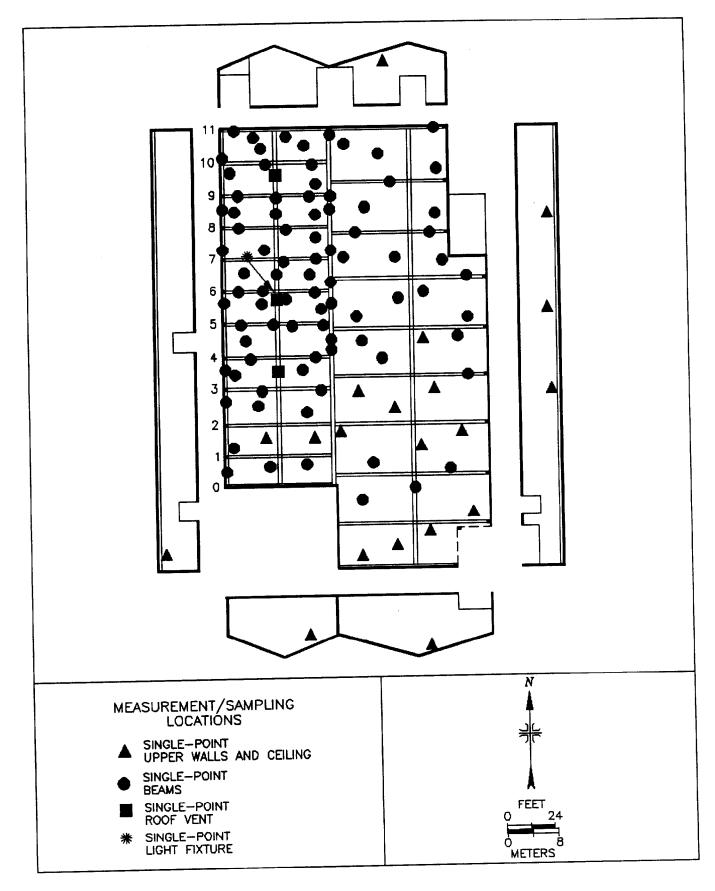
Building 3, Upper Surfaces — Measurement and Sampling Locations
